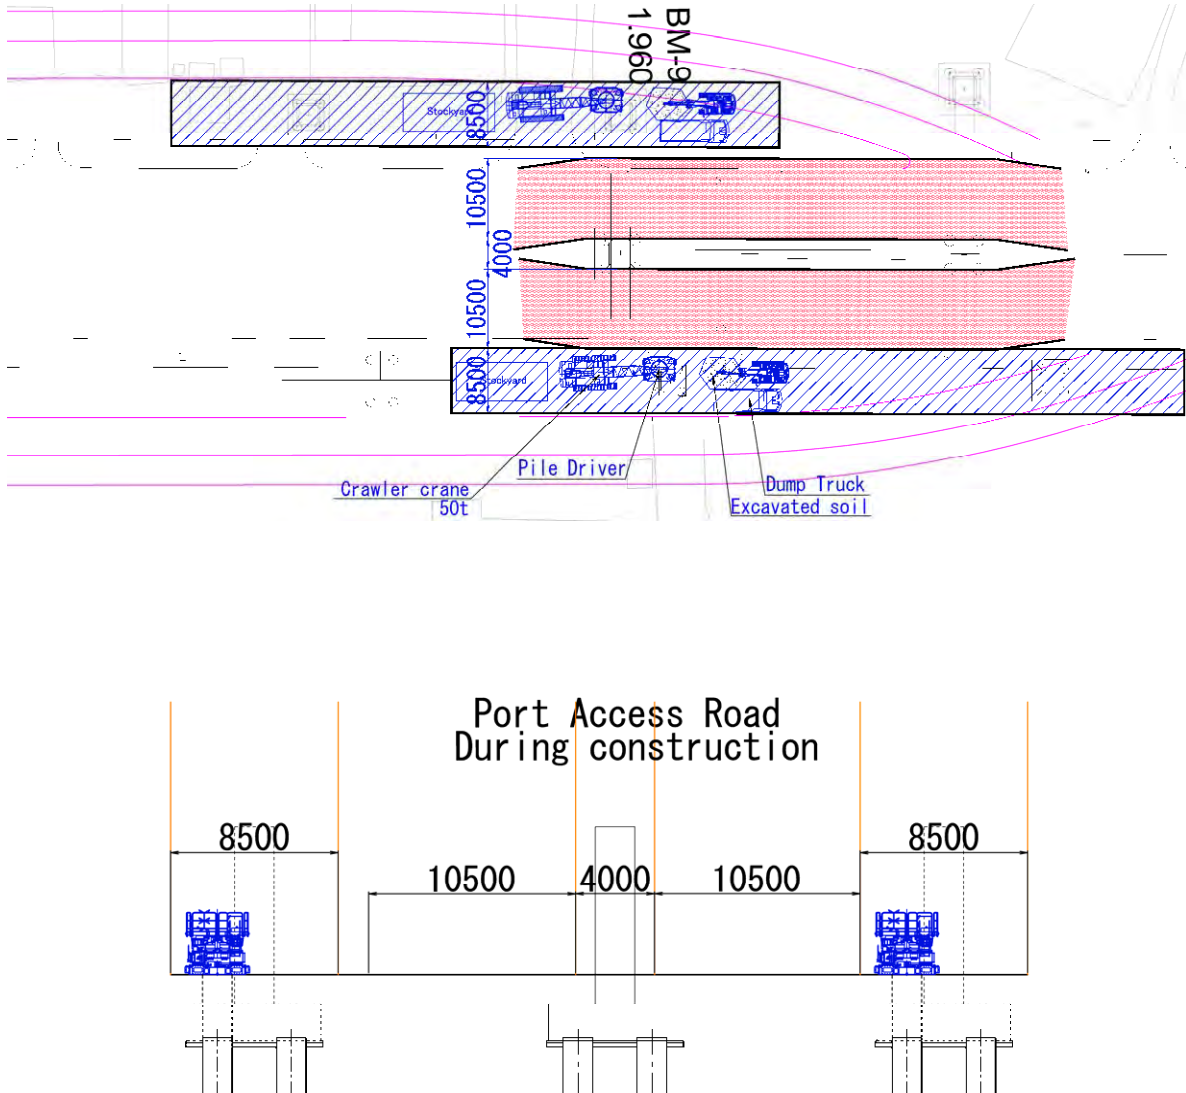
Median Foundation in Port Access Road RC2-P7, Cast-in-situ pile D1.5m
